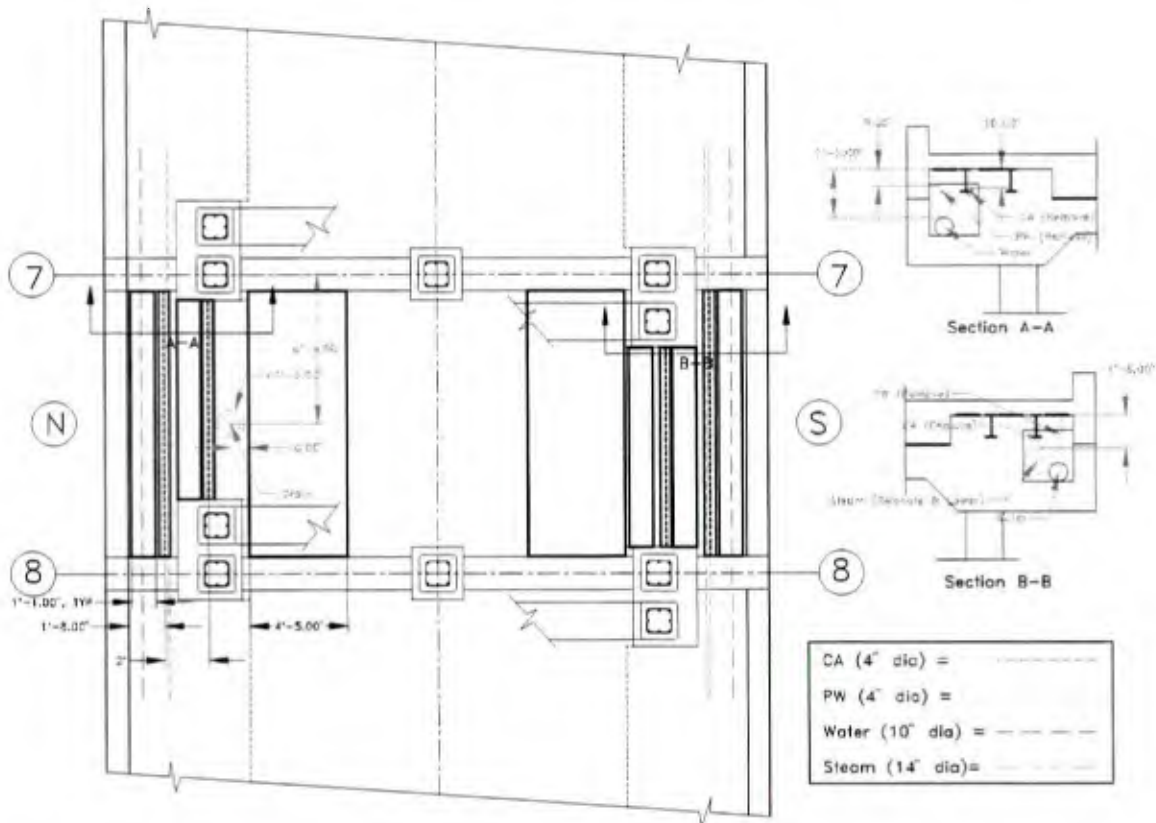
Plan of typical underside deck reinforcement - structural I-sections and carbon laminate.
